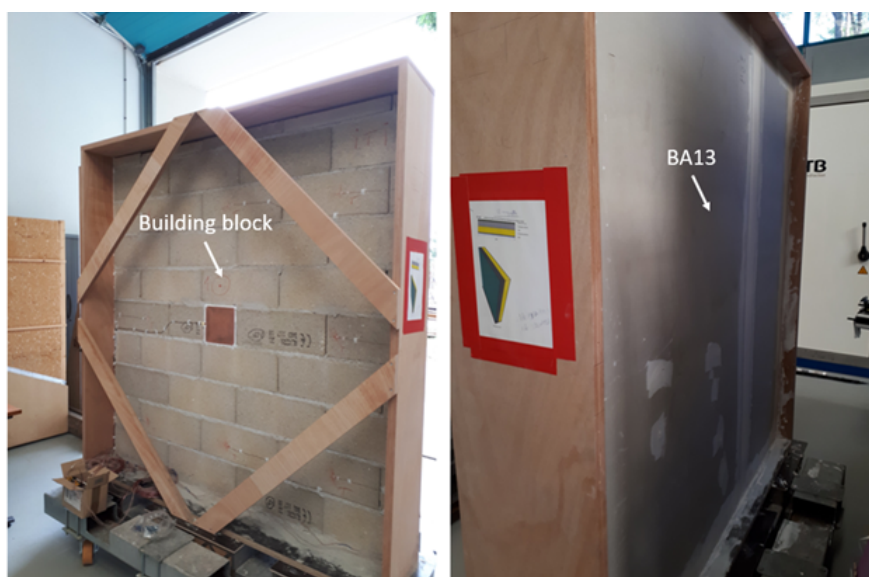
Tested IWI wall: (left) Real views of the building block layer and (right) of the complete wall.
